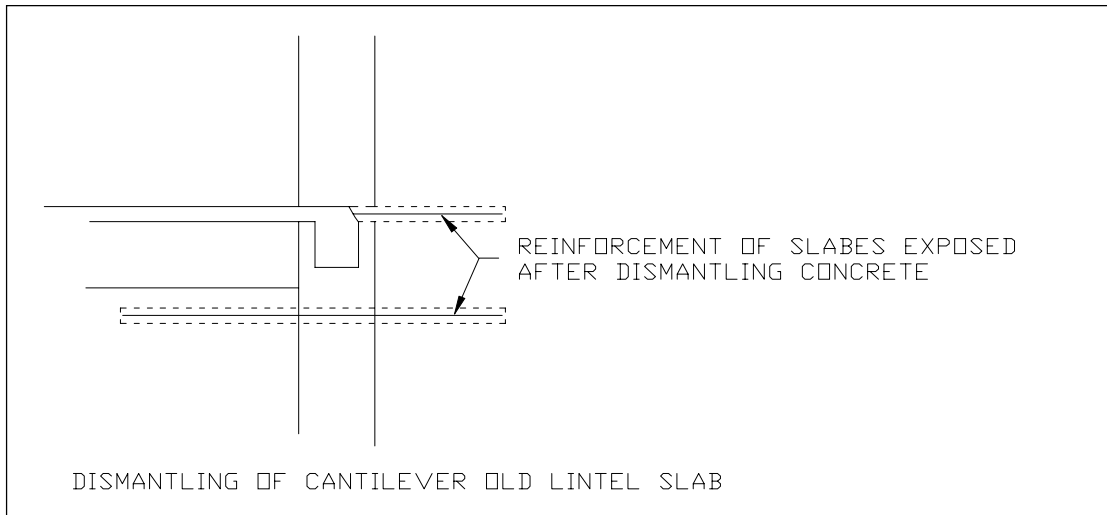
(b): Concrete of Cantilevered slabs dismantled
